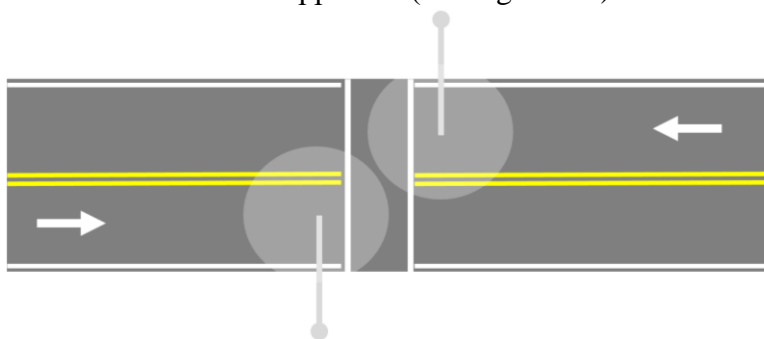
Recommended Midblock Crosswalk Lighting Layout from FHWA's Informational Report on Lighting Design for Midblock Crosswalks
